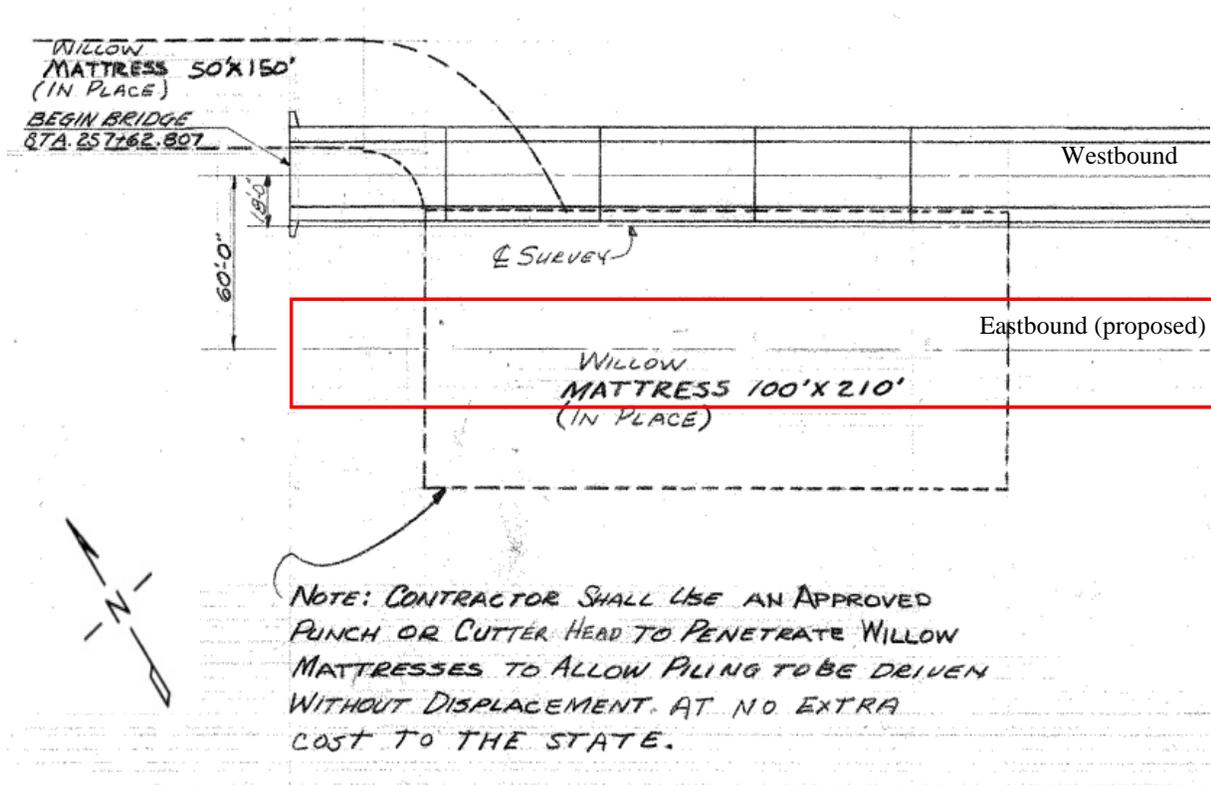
Typical Section View of the West Abutments of the US 90/98 Tensaw-Spanish River Bridge Showing the Scour Countermeasure Protections.<sup>177</sup>
